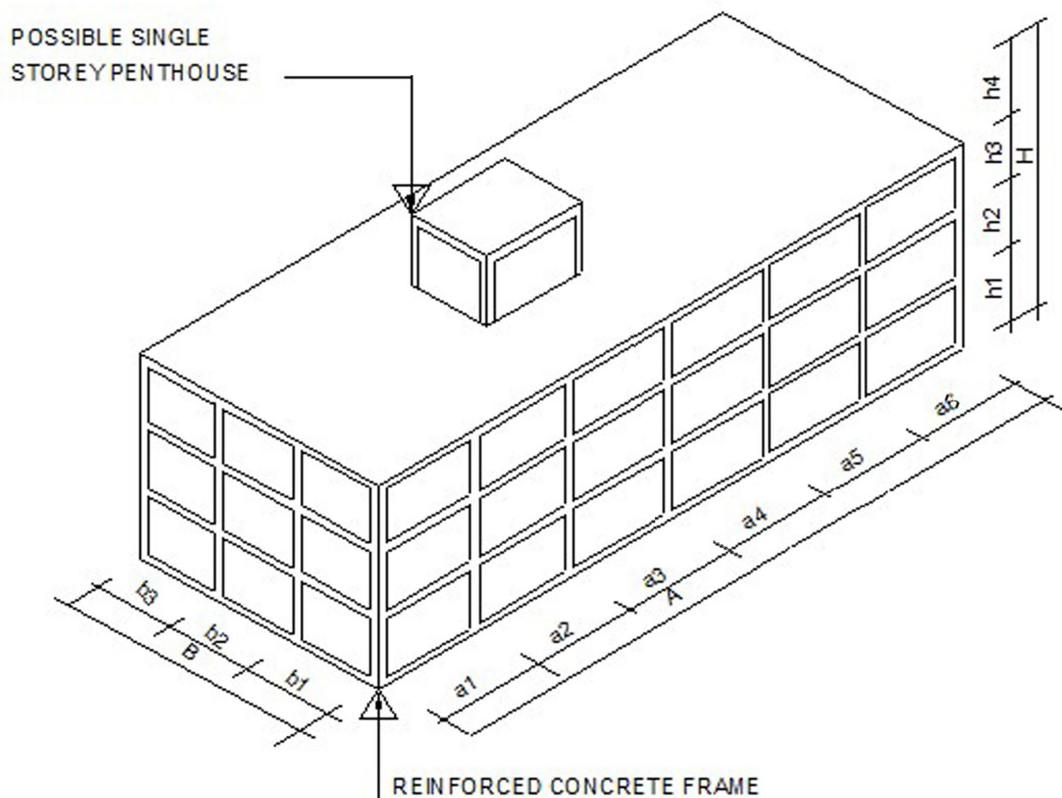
SCHEMATIC DIAGRAM OF REINFORCED CONCRETE FRAME
